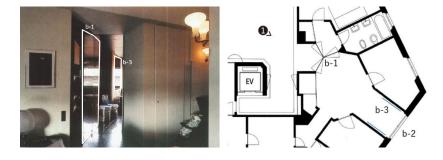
Interior view and enlarged floor plan of Housing on Corso Italia.
